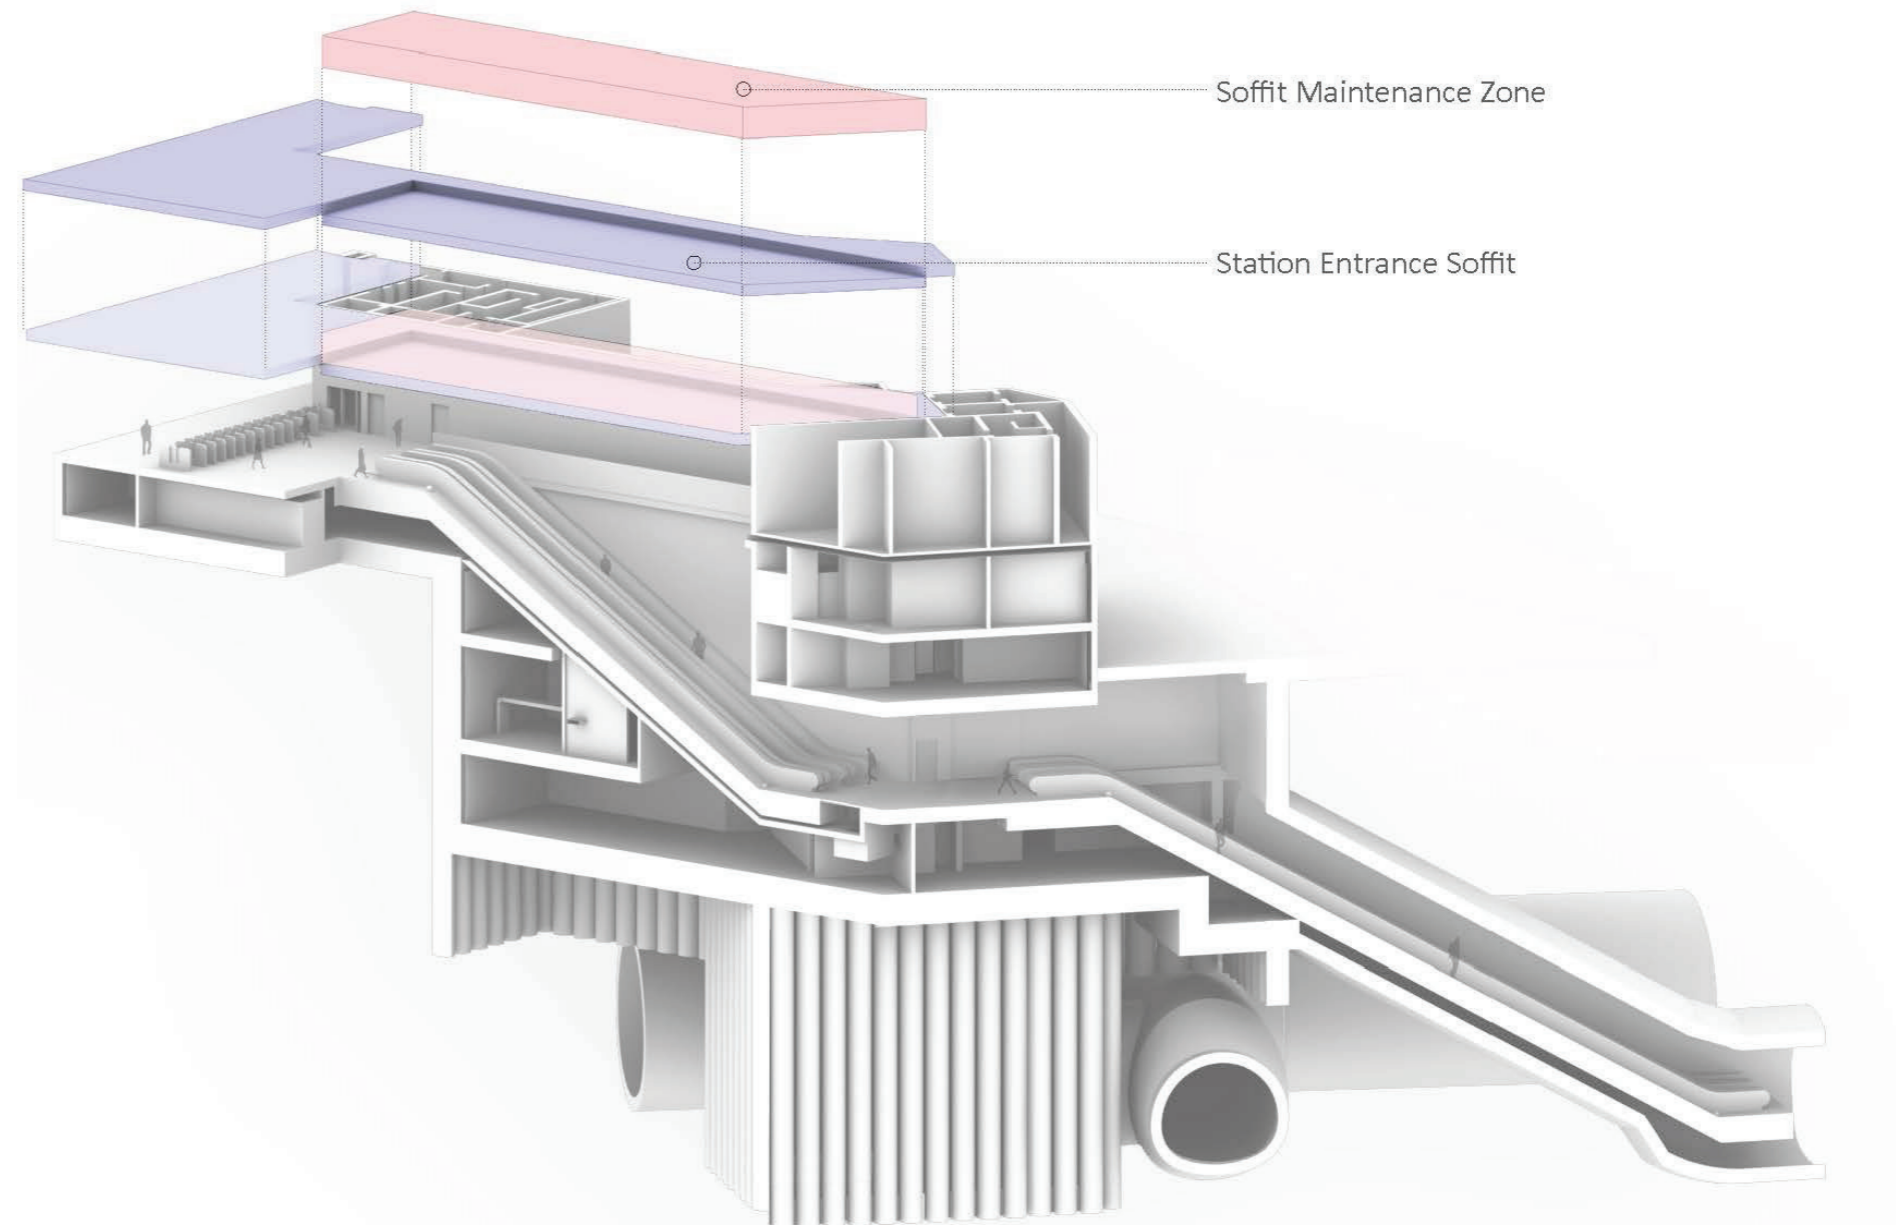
Isometric view of proposed soffit maintenance zone in the Station Entrance Hall
